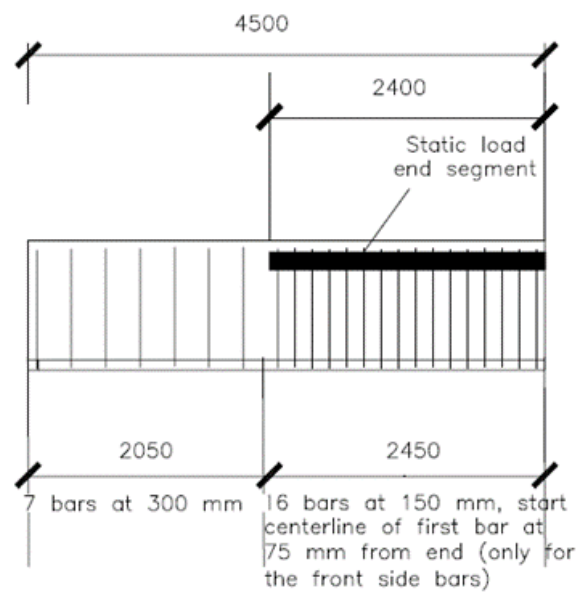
Elevation of front vertical reinforcement arrangement for barrier specimens S-1 and S-2 with end loading
